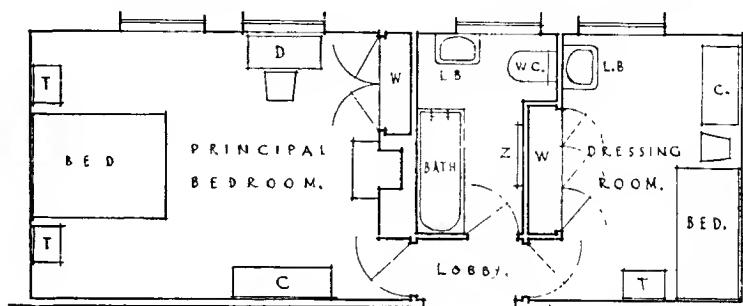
The bedroom. A typical suite containing bath- and dressing-room
